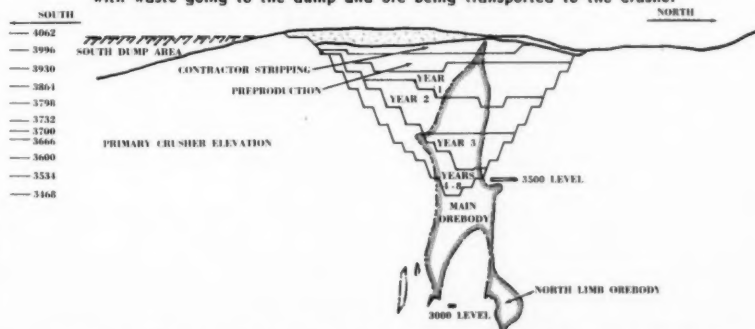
Working benches are 33-ft high and on reaching final pit limits are consolidated to leave a 66-ft bench; the over-all wall slope in the mine will be 51°
